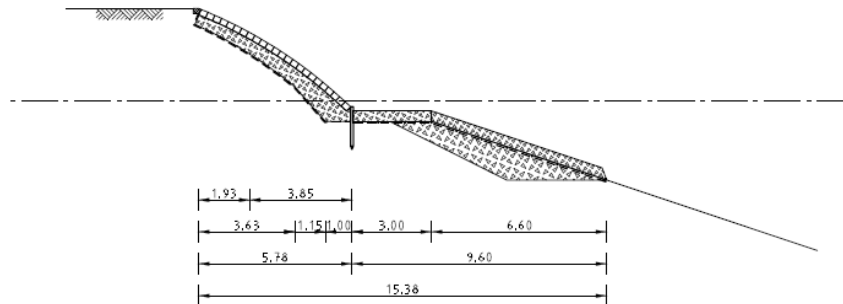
Cross-section of the slope revetment at the riverside of Pier 1 (Port of Rotterdam)
